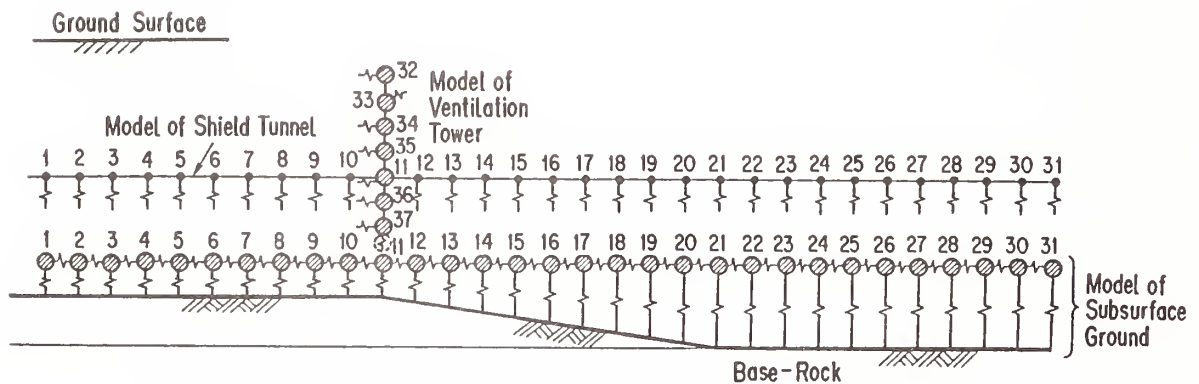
Model of Shield Tunnel, Ventilation Tower and Subsurface ground
